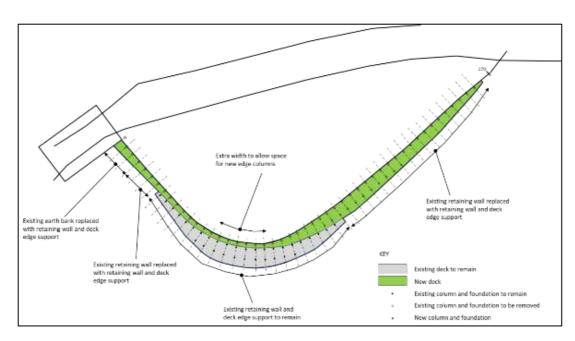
Illustration of extension to stilt structure supporting the Longbridge SLTL
